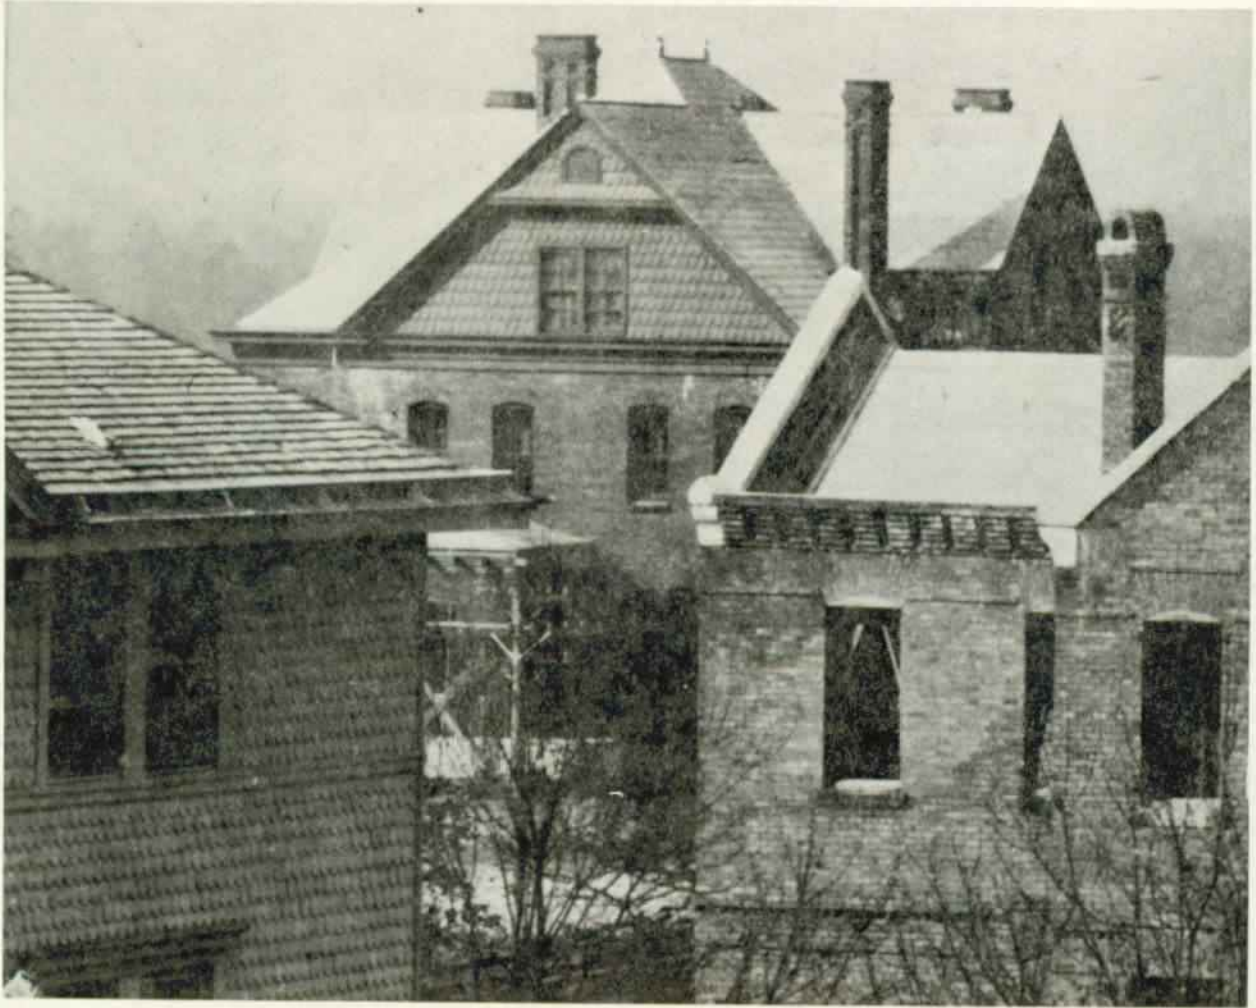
From Overall View of Tuskegee Campus, 1902. Note the Oaks with the dining room addition under construction. (Frances Benjamin Johnston Collection, Library of Congress)
